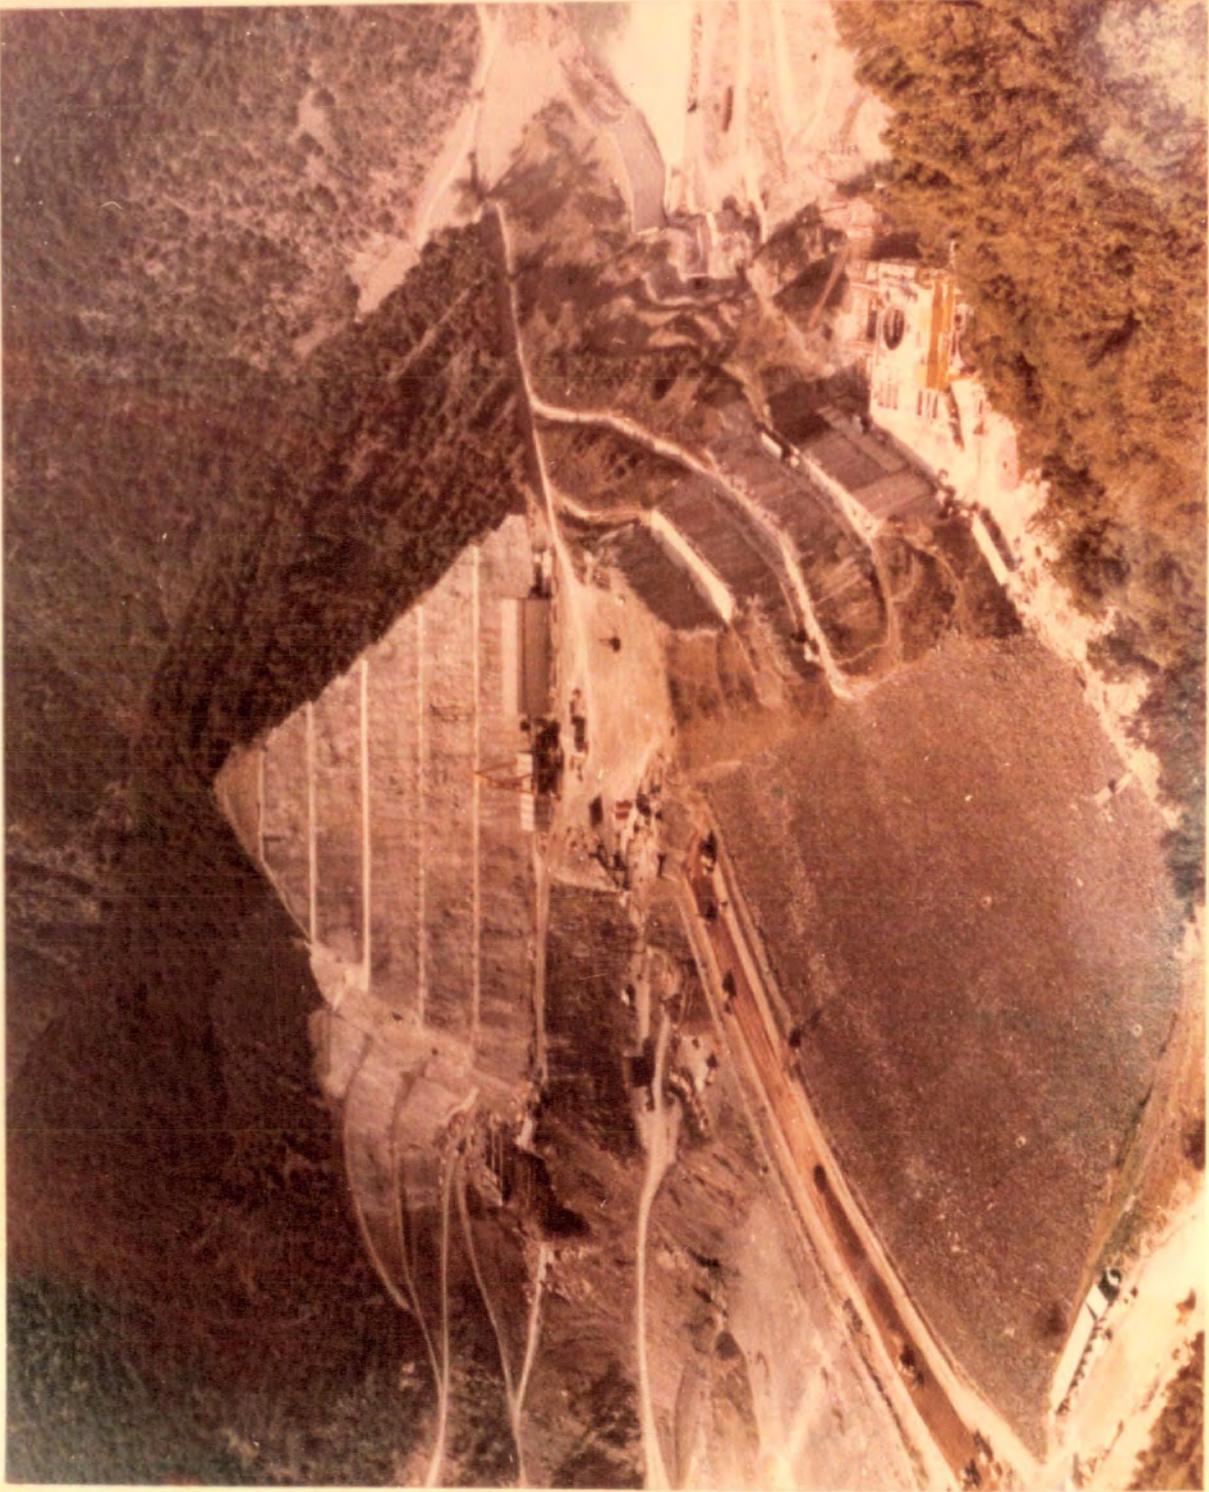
Sfikia dam: Excavations at riverbed and left abutment; general view
